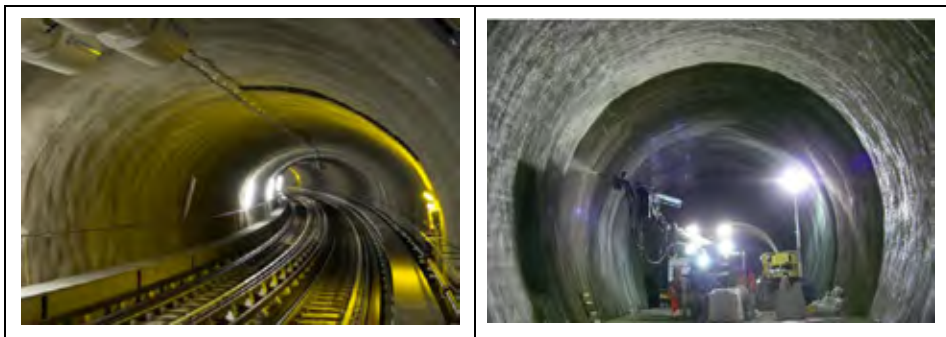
Two tunnels where single-shell construction with sprayed-membrane for water control has been the successful solution. The tunnel on the left is from the Lausanne metro (photo: Karl Gunnar Holter), and the tunnel on the right is the Hindhead main road tunnel in England during final shotcreting. (Photo:Shani Wallace, Tunnel Talk, July 2011).
